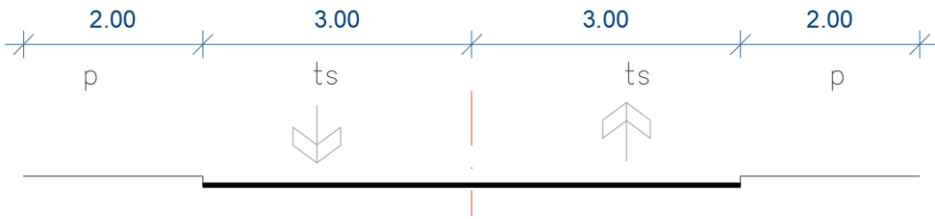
Geometrical cross section of proposed street (outside of the regulatory line border)
